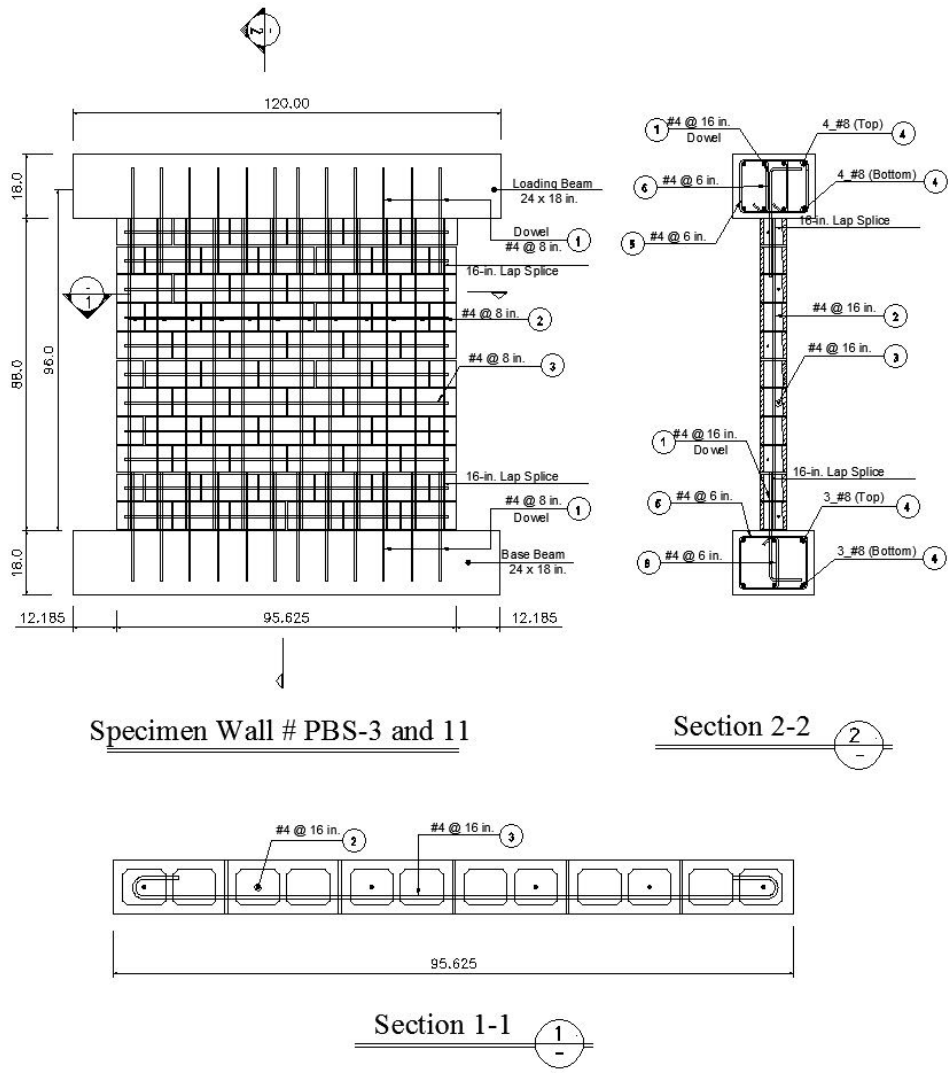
Reinforcing details of the wall tested by Ahmadi (2012)
